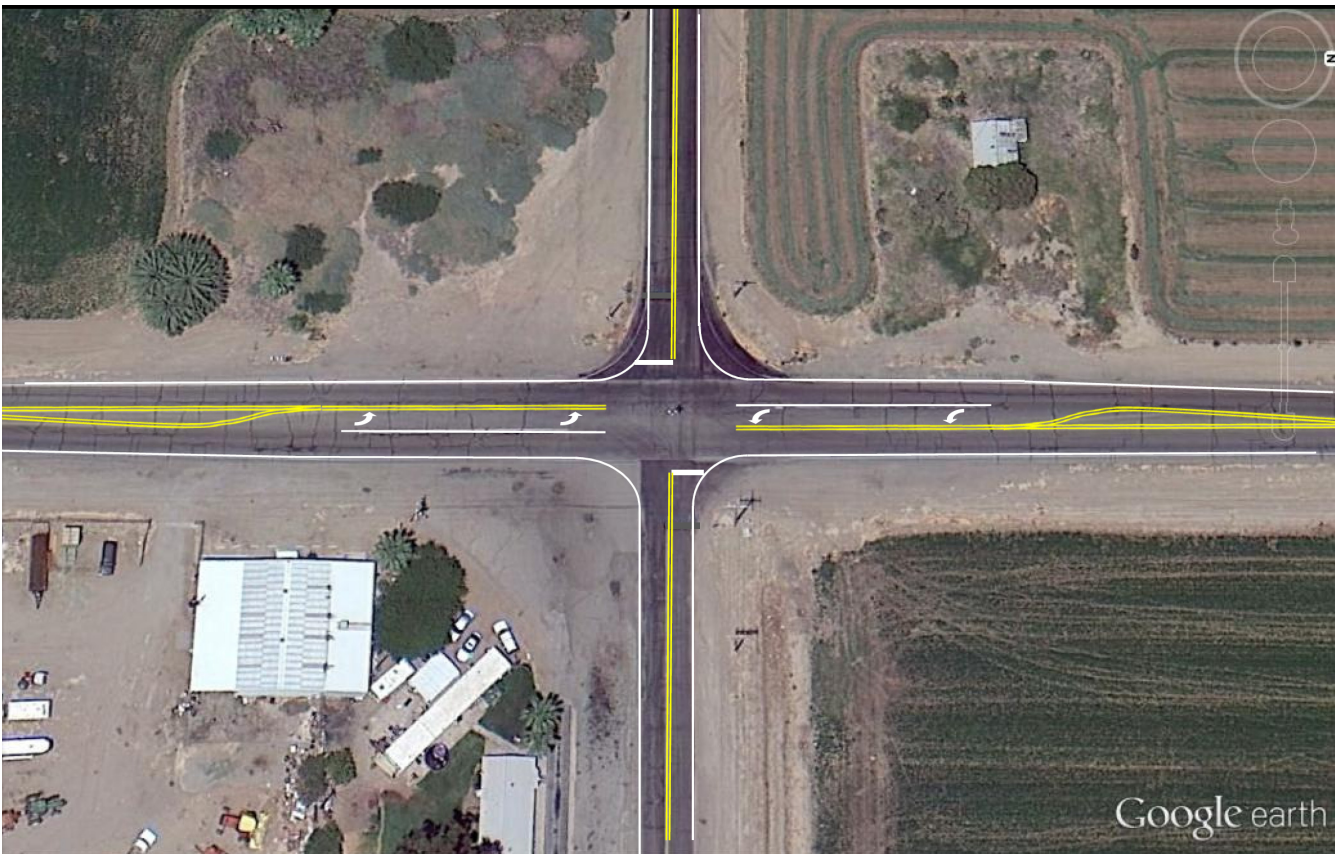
Sketch of Recommendations for the Mohave Road/Poston Road Intersection
